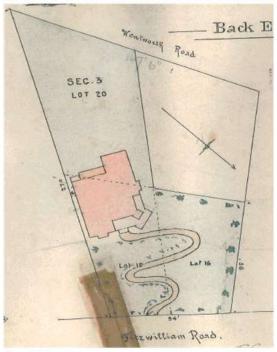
Site plan of the proposed residence, 1909 Source: Prof. G. Murrell
